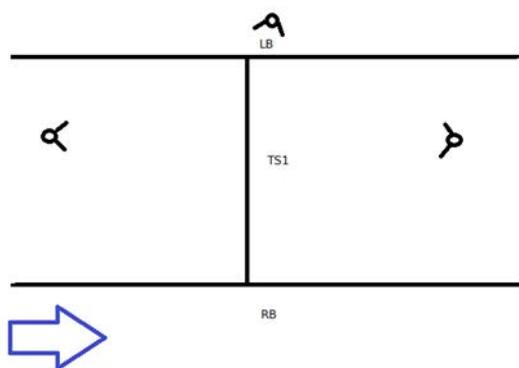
Site plan for Tidal Crane Barrier 6
